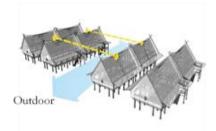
Typical layout of Jambi people's yard with open space for social activities (Author)
